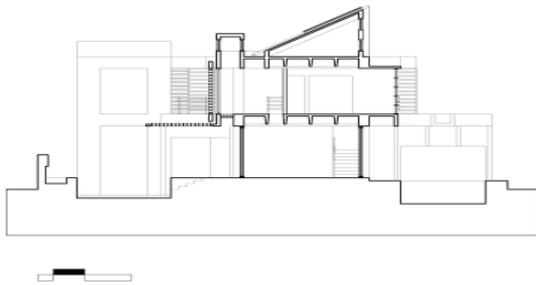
Section of the house looking west (location of cut indicated in ground floor plan)
